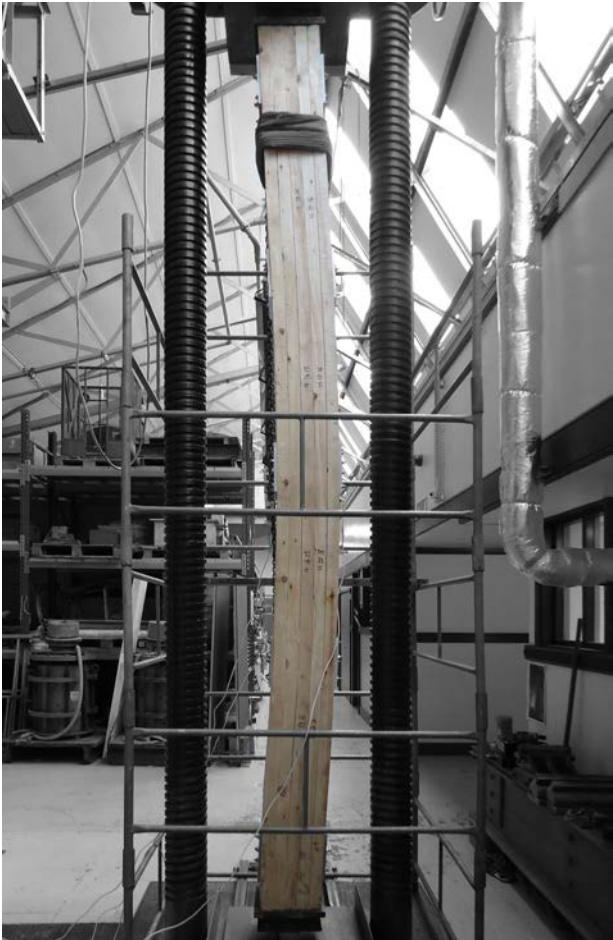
Final buckling mode shapes in retesting trials with columns 13-16.
